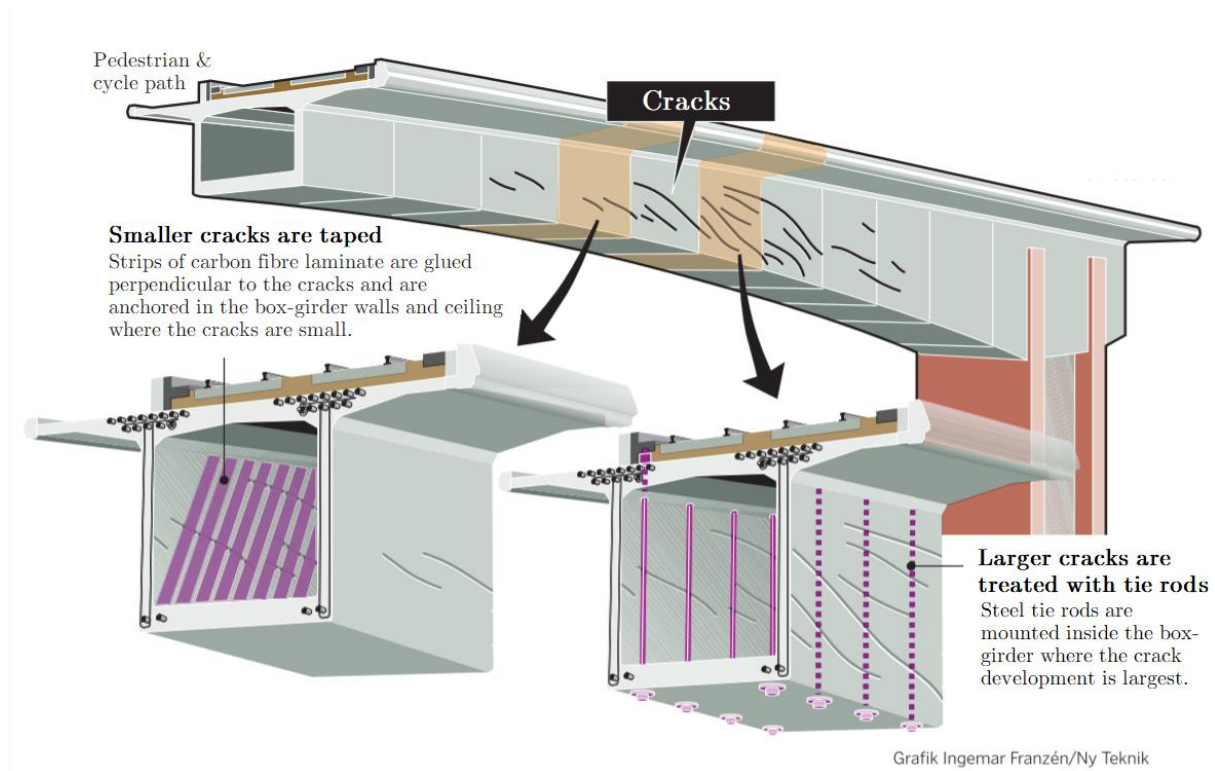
Strengthening of the Alvik bridge (SBUF, n.d.).
